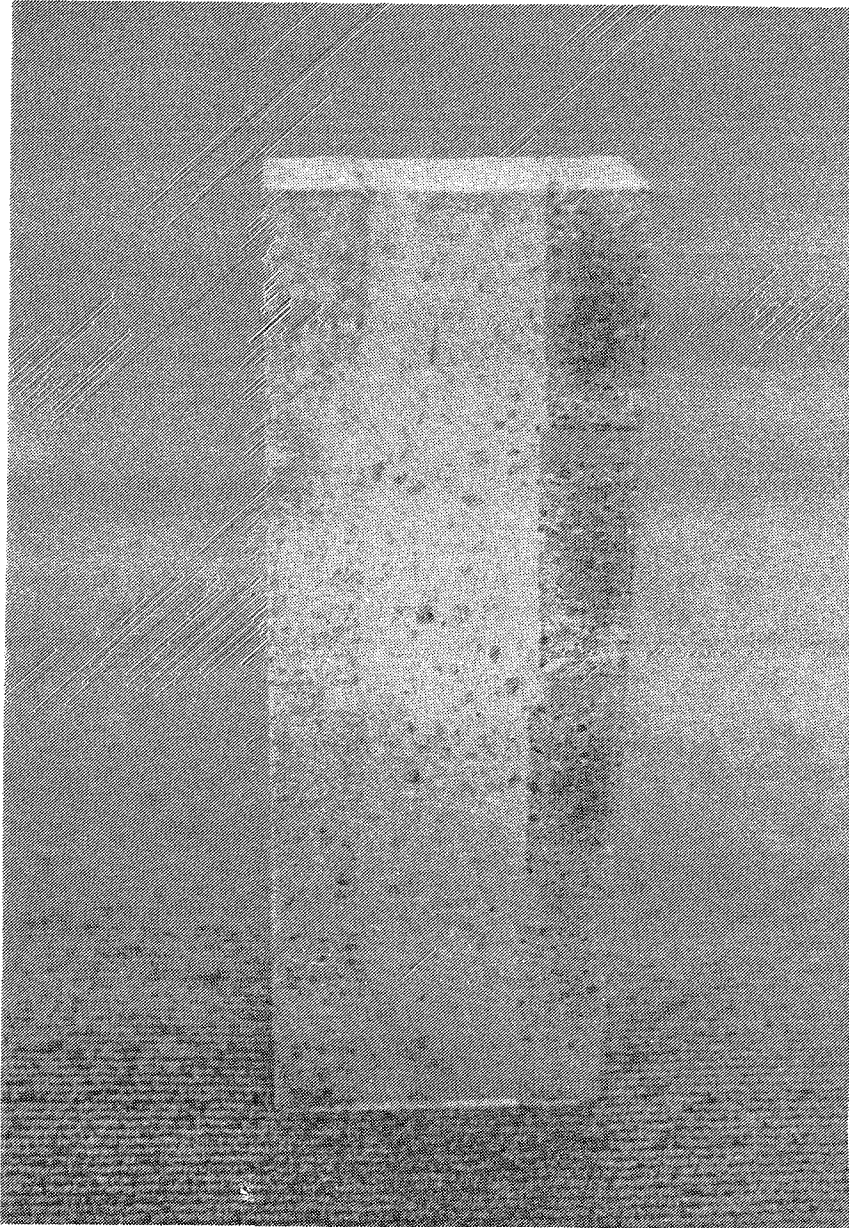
GROUT COMPACTION IN CONCRETE PRISMS
